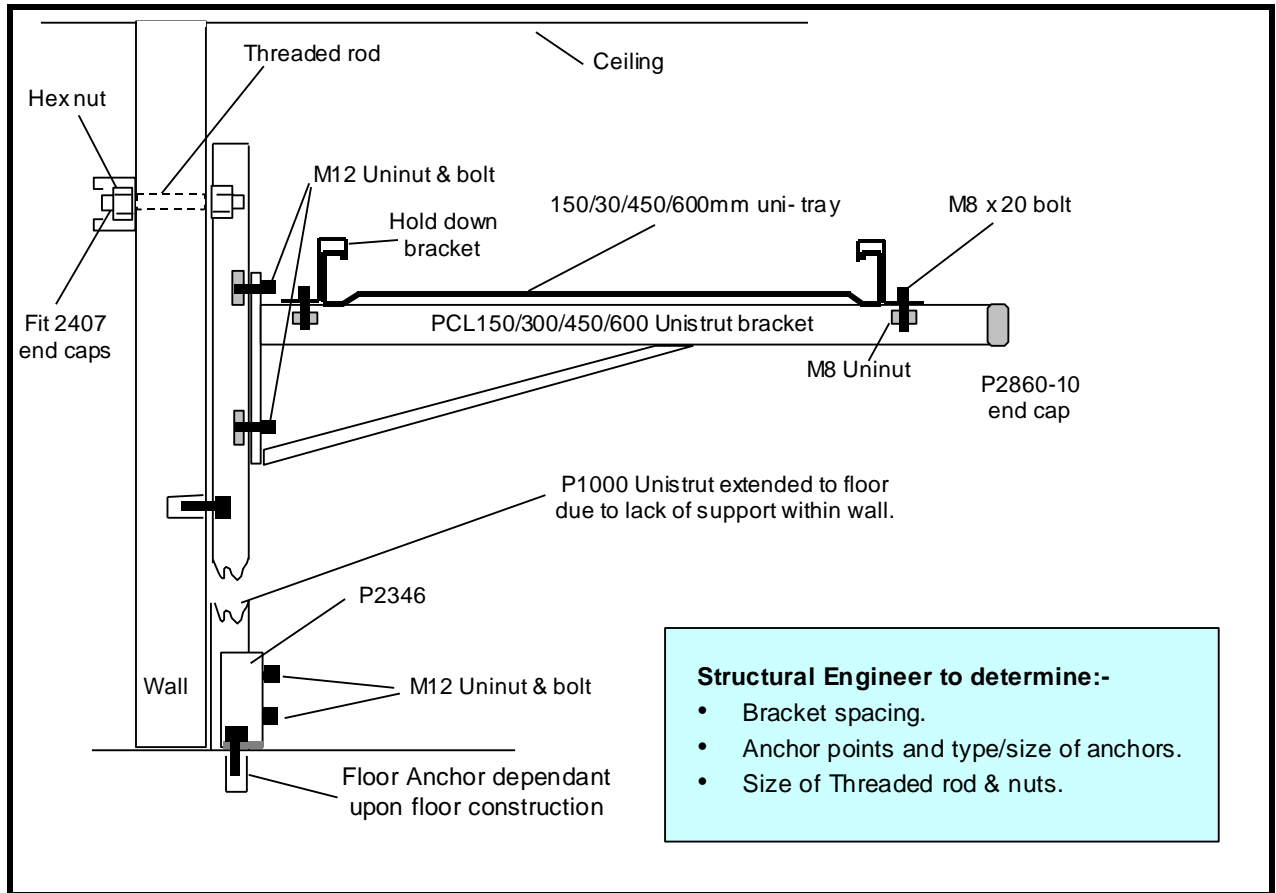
Cantilever Bracket on Cavity Wall, Supported to Floor
